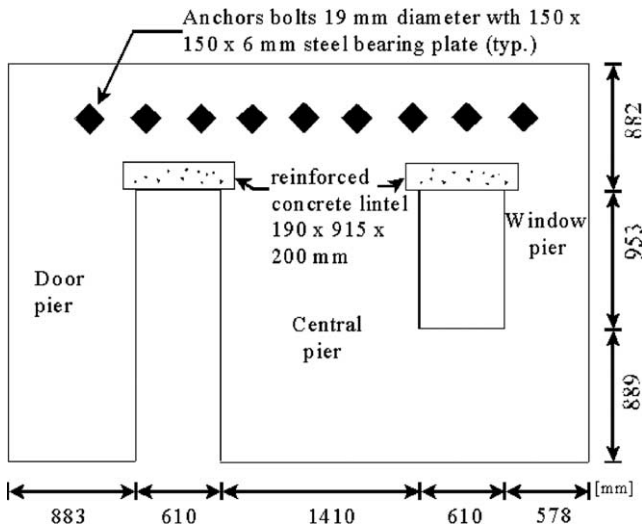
Elevation of URM specimen (parallel to loading): east wall.
